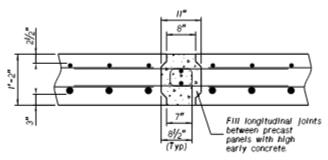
Longitudinal joints between precast concrete panels of the paving section (I-680/West Center Road Bridge)
